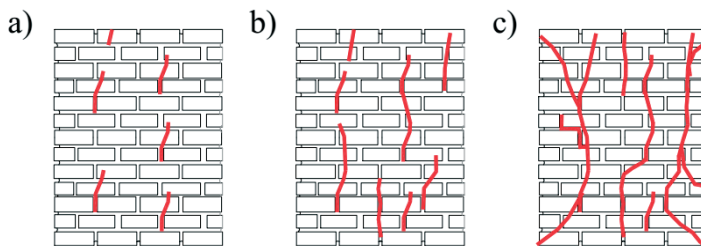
Phases of the wall destruction: a) first phase – appearance of small cracks, b) second phase – widening of cracks, merging of cracks and appearance of the first scratches, c) third phase – connection of scratches and cracks – the construction failure [4]
